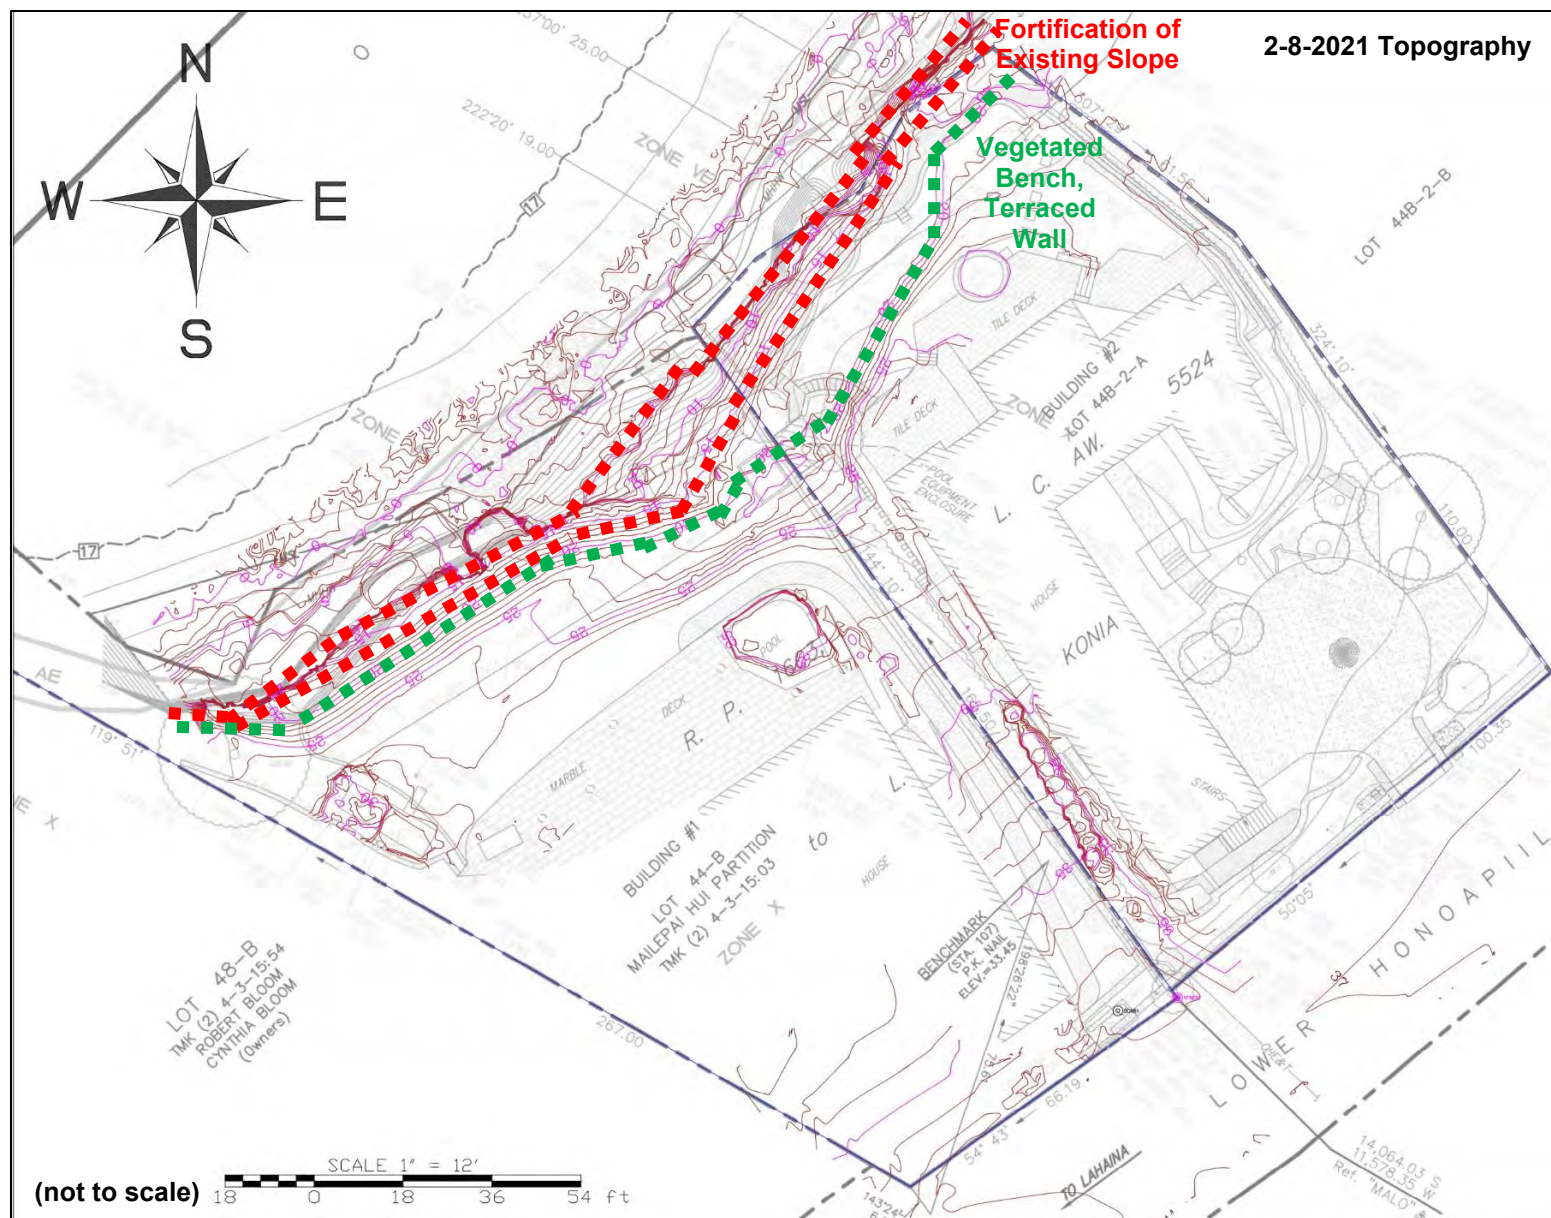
Concept plan view for fortified conglomerate with terraced wall(s) alternative
